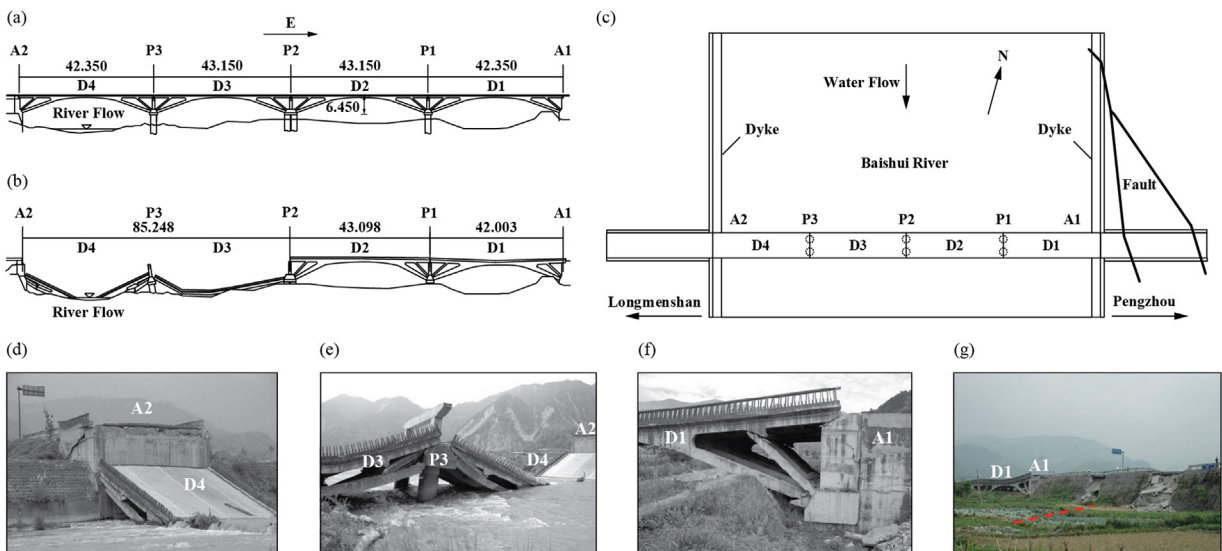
Xiaoyudong Bridge during the 2008 Wenchuan earthquake: (a) elevation view of original bridge (unit: m); (b) elevation view of collapsed bridge (unit: m); (c) plan view of bridge and surface fault rupture; (d) damaged abutment A2; (e) tilted pier P3 and collapsed spans D3 and D4; (f) damaged span D1 and abutment A1; (g) damaged approach road behind abutment A1 (Fig. 15a–c is generated based on information provided by Kosa et al. [68]; Fig. 15d–f is modified from Kawashima et al. [63]; Fig. 15g is modified from Lin et al. [72]).
